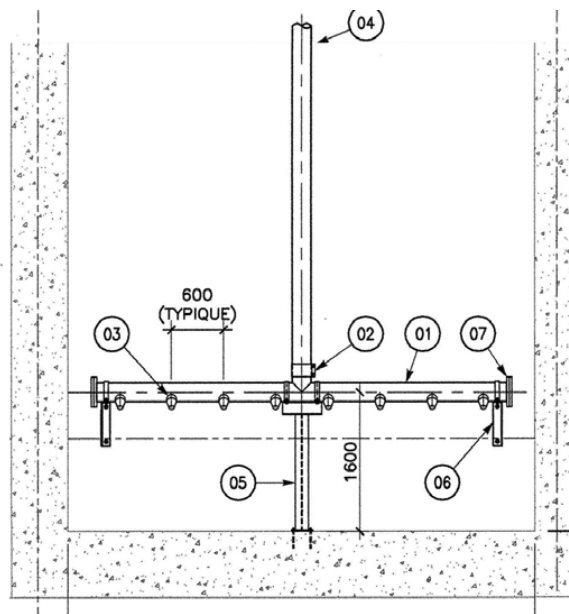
Basin Nozzle Manifold Installation Drawing
